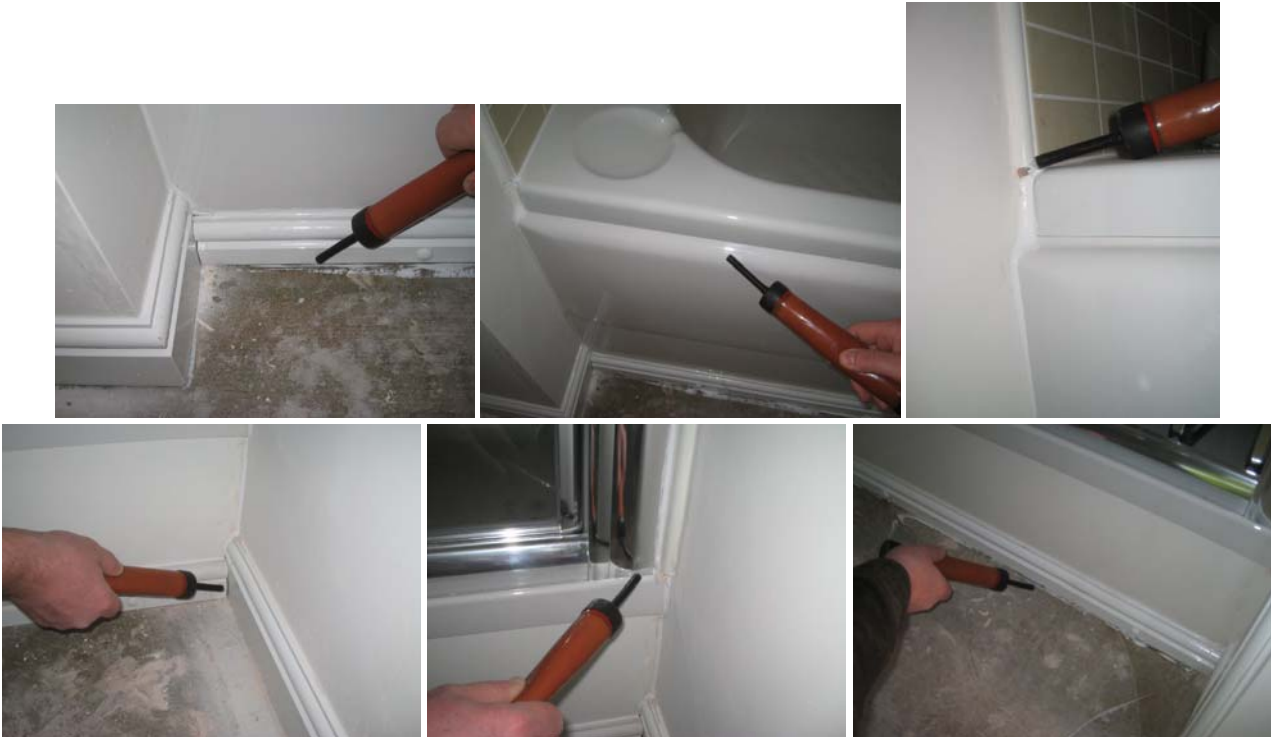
Air leakage around the bath panel in the first floor bathroom and around the shower tray fascias in the second floor bathroom and first floor en-suite.
